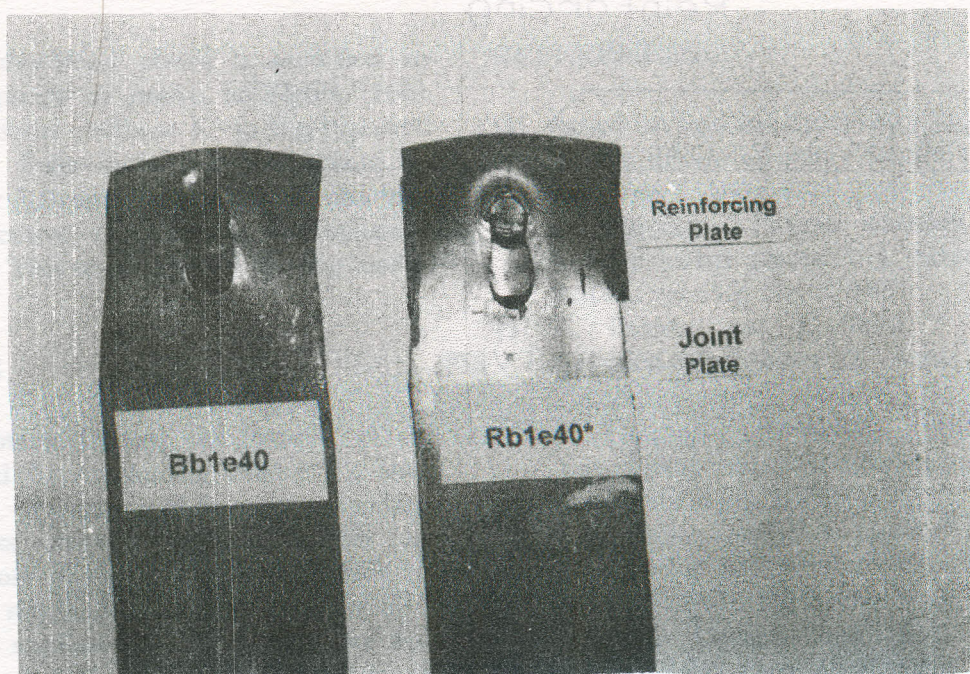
Failure of bolted and reinforced joints with single bolt.
